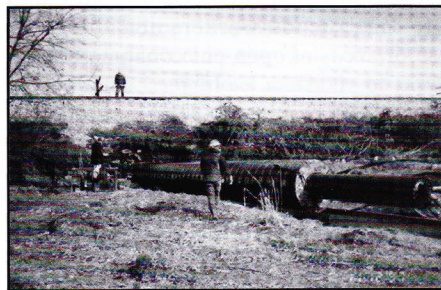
Example of pipe ramming. Photo courtesy of Hammerhead Mole, Inc.
